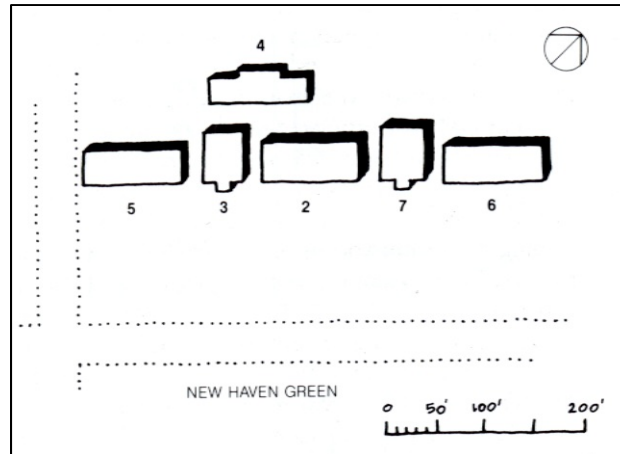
Old Brick Row 1717- 1803 (#2 is Connecticut Hall)
